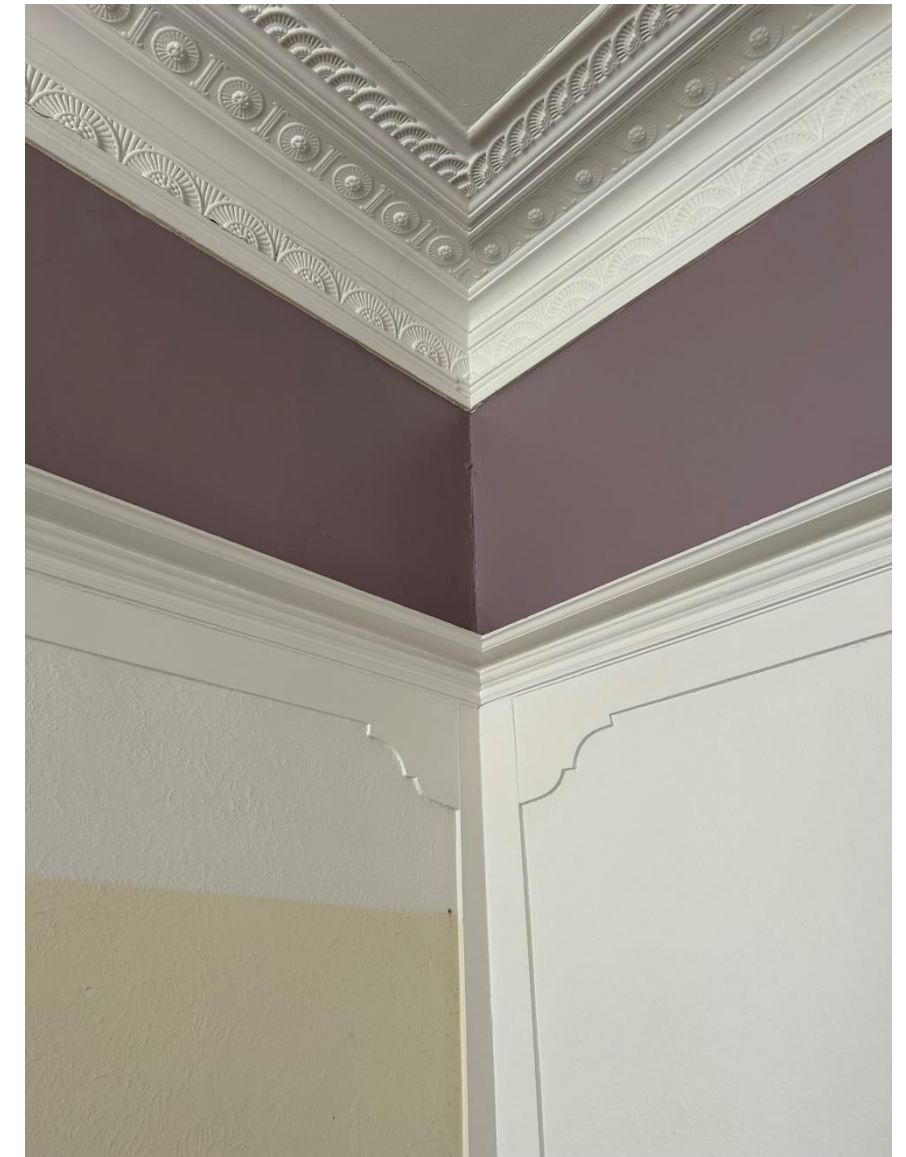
Historic cornice, plate rail, picture rail & panelling detail in corner of room
